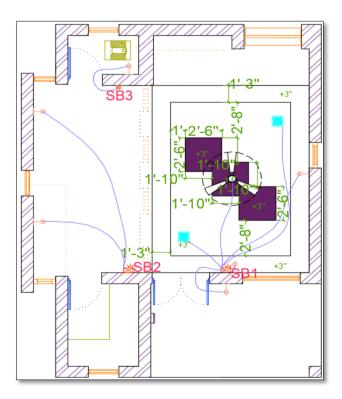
Proposed False Ceiling Design and Electrical Layout of Design Project-II Nandghar Kashipura
